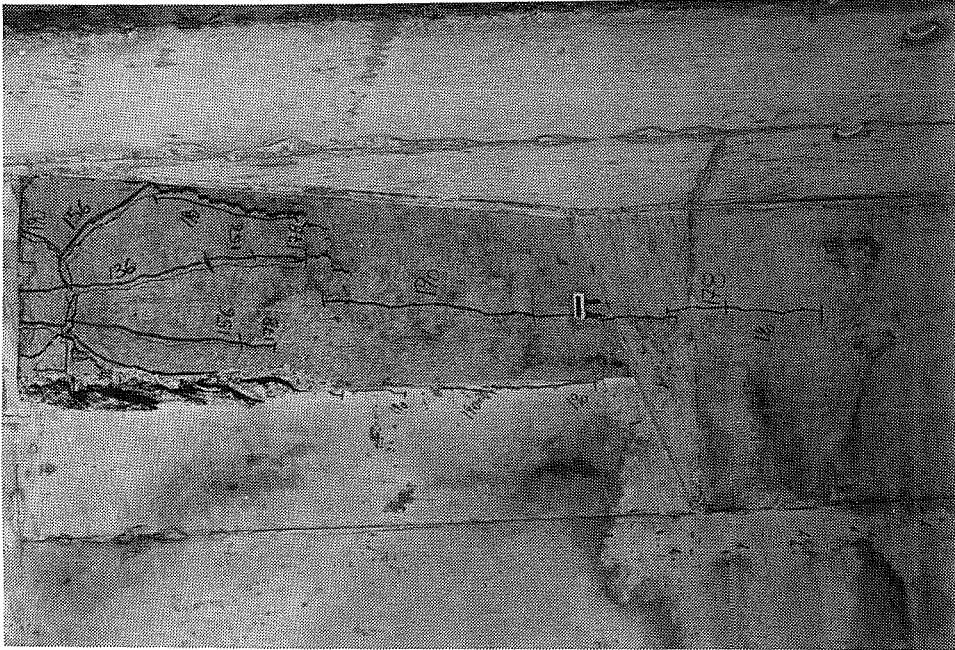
Local Zone Cracking and Concrete Spalling (SpecimenCorner21)
